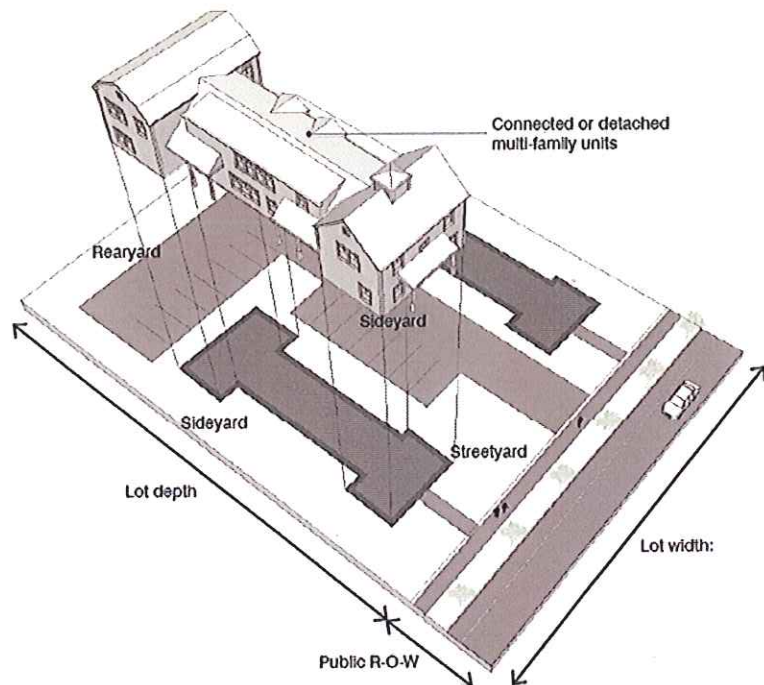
BUILDING AND SITE TYPES
